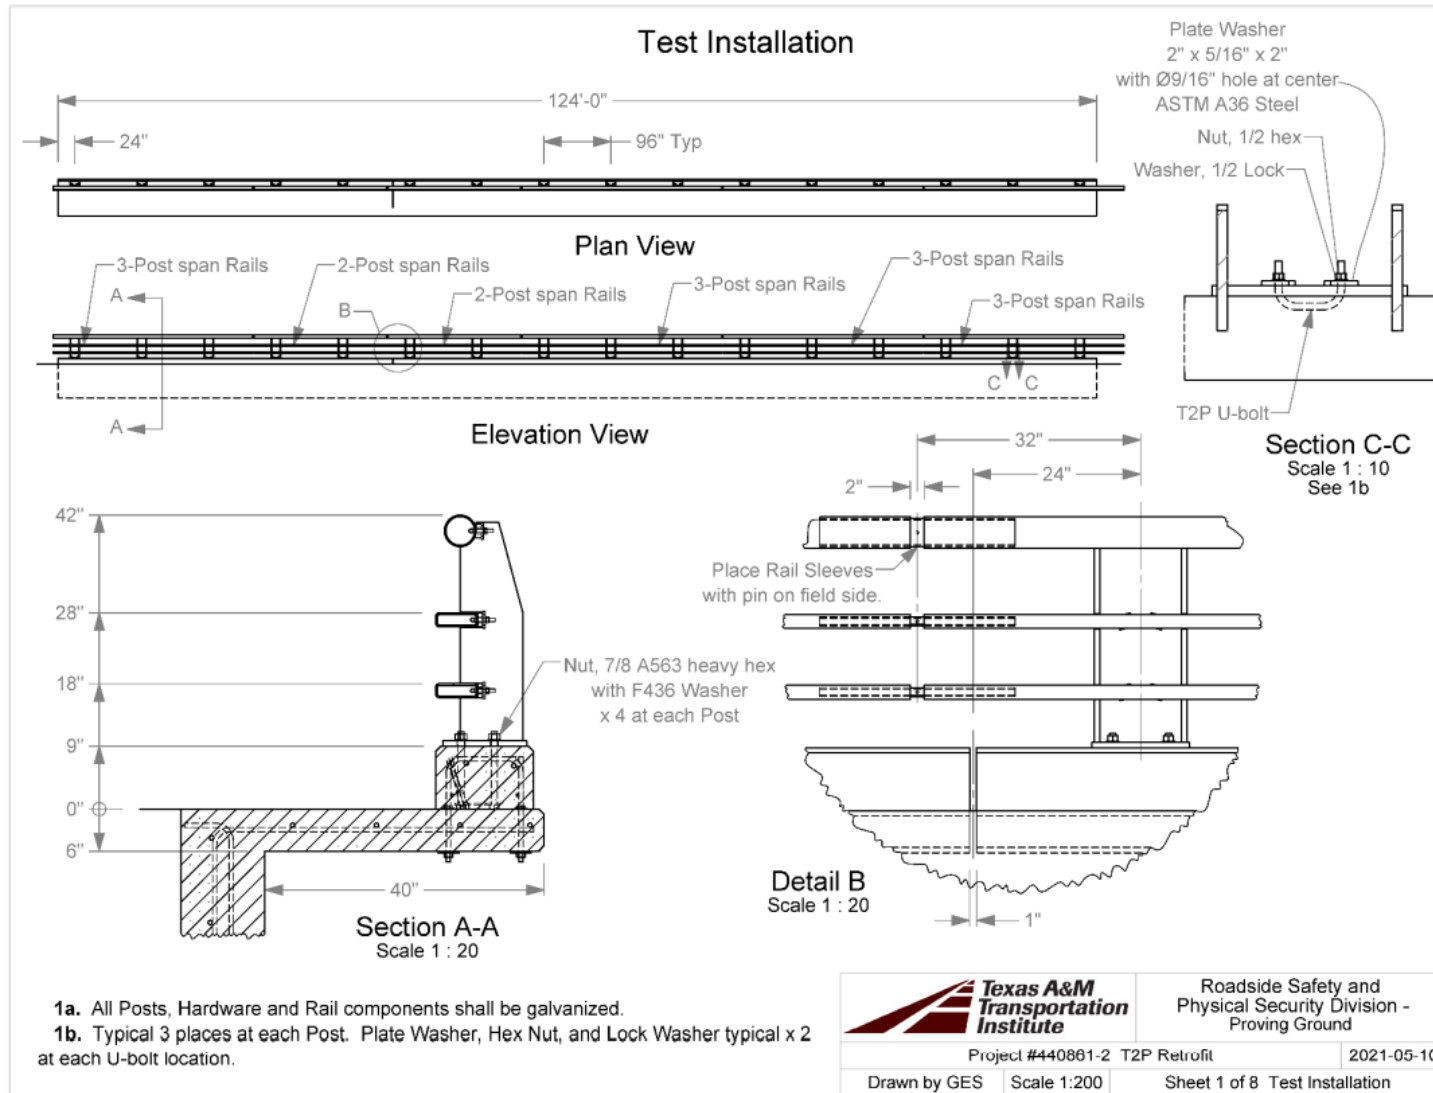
Design Drawings for T2P Retrofit Bridge Rail [14]
